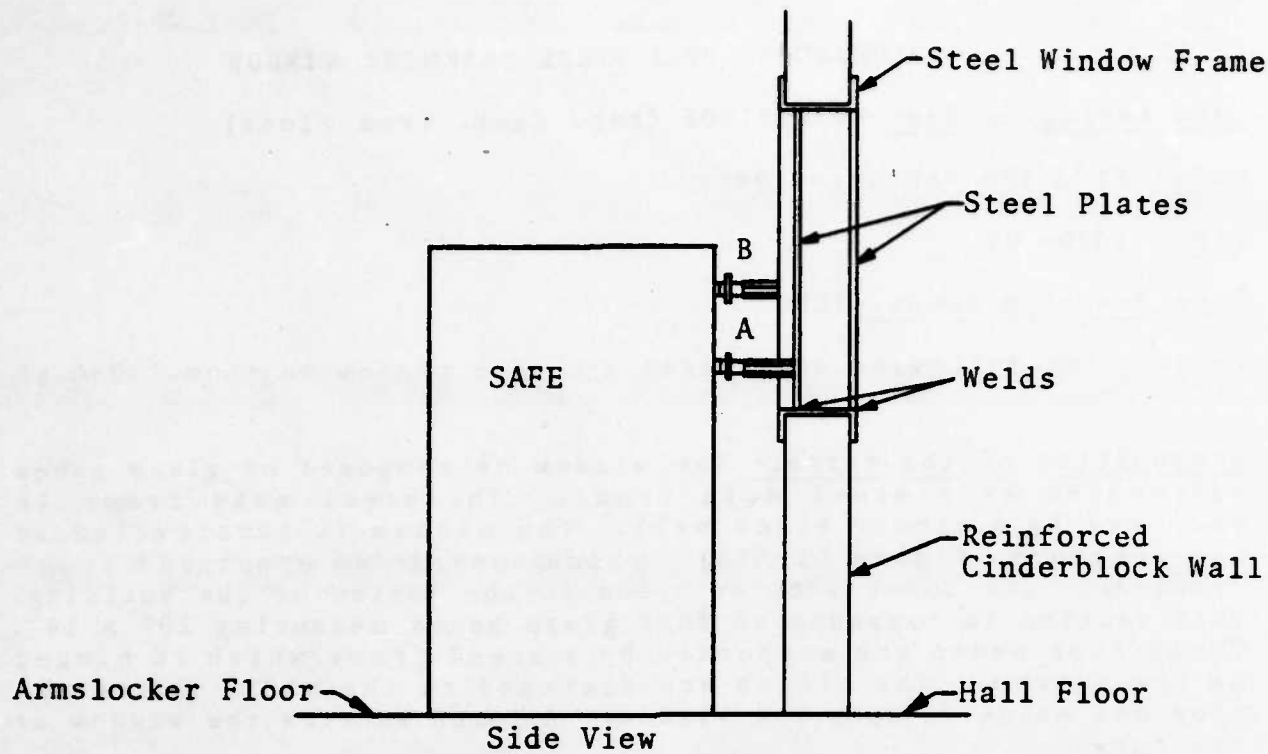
Installation of Instrumented SSS For Signatures of an Armslocker Steel Window Plate
